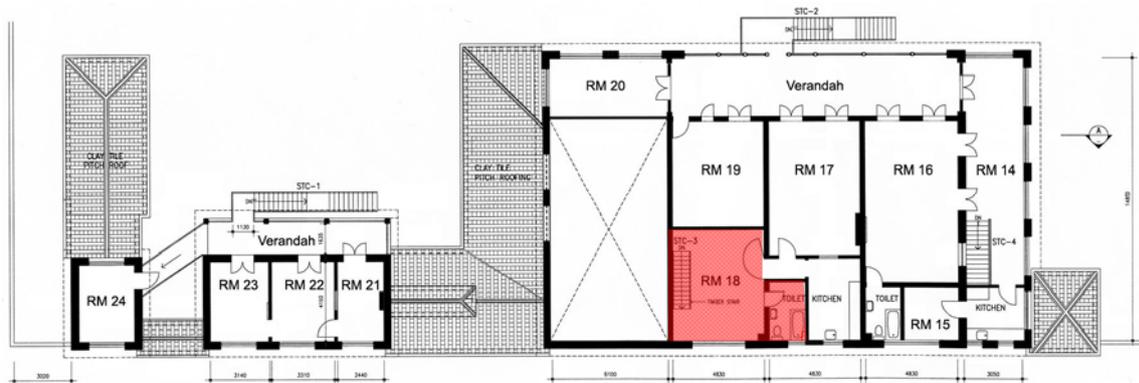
Location of RM 18 on the first floor at the former clubhouse (1:400).
